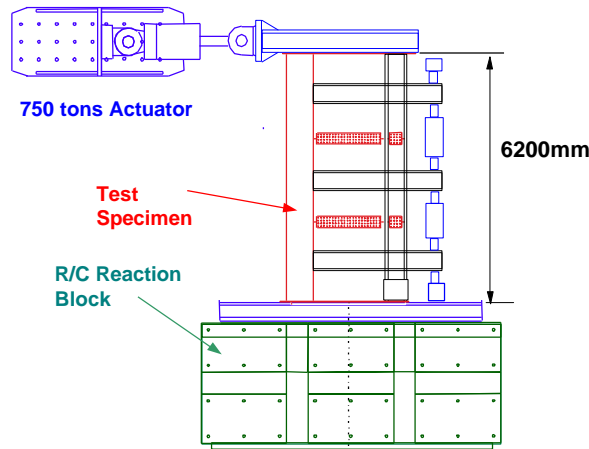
Test set-up and a steel plate shear wall specimen in it, (Astaneh-Asl, 2000).
